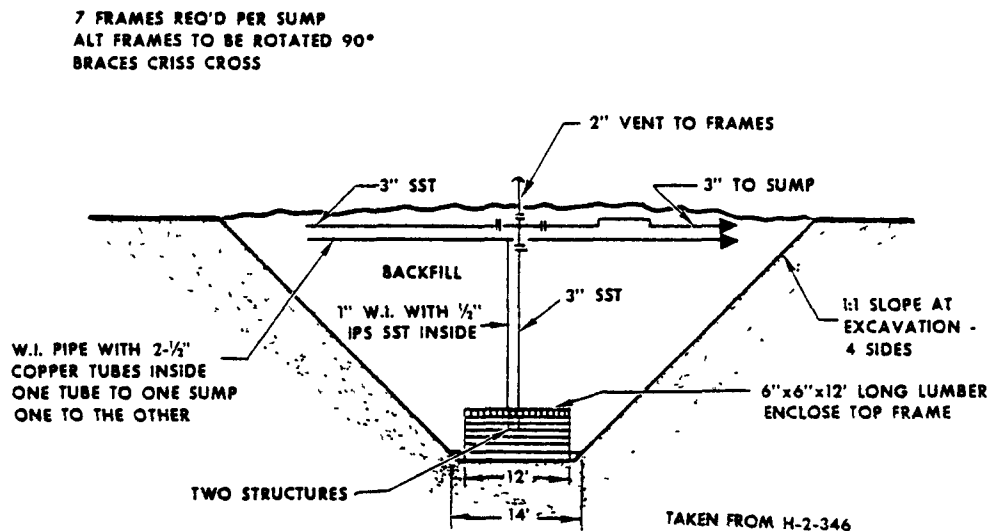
216-Z-5 Crib Cross Section.(14)
